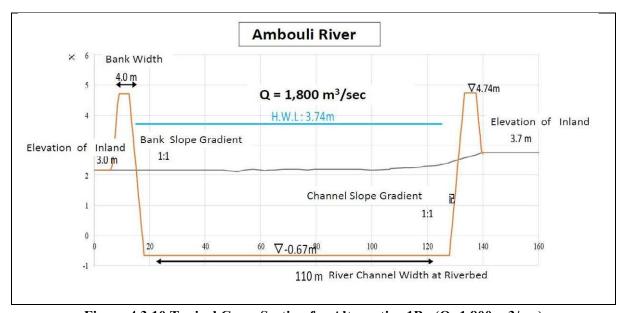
Typical Cross Section for Alternative 1B (Q=1,800 m3/sec)
